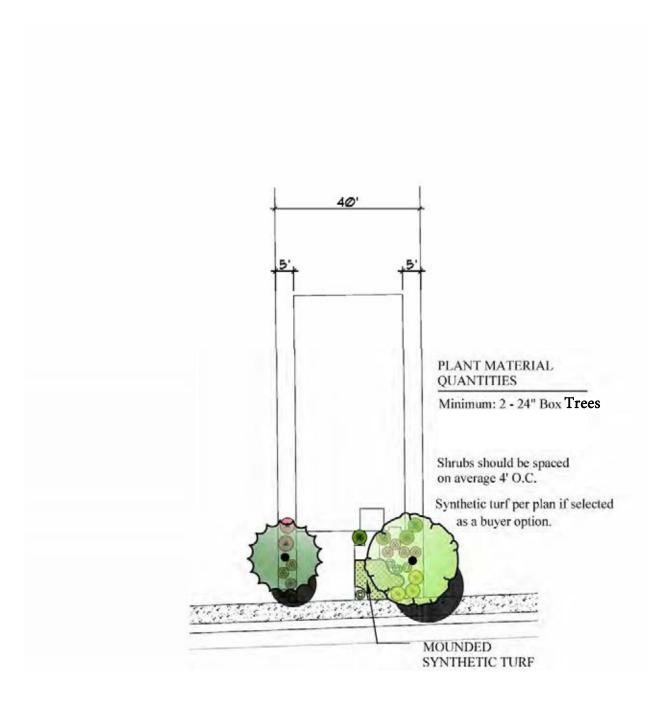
TYPICAL FRONT YARD, 40' LOT
